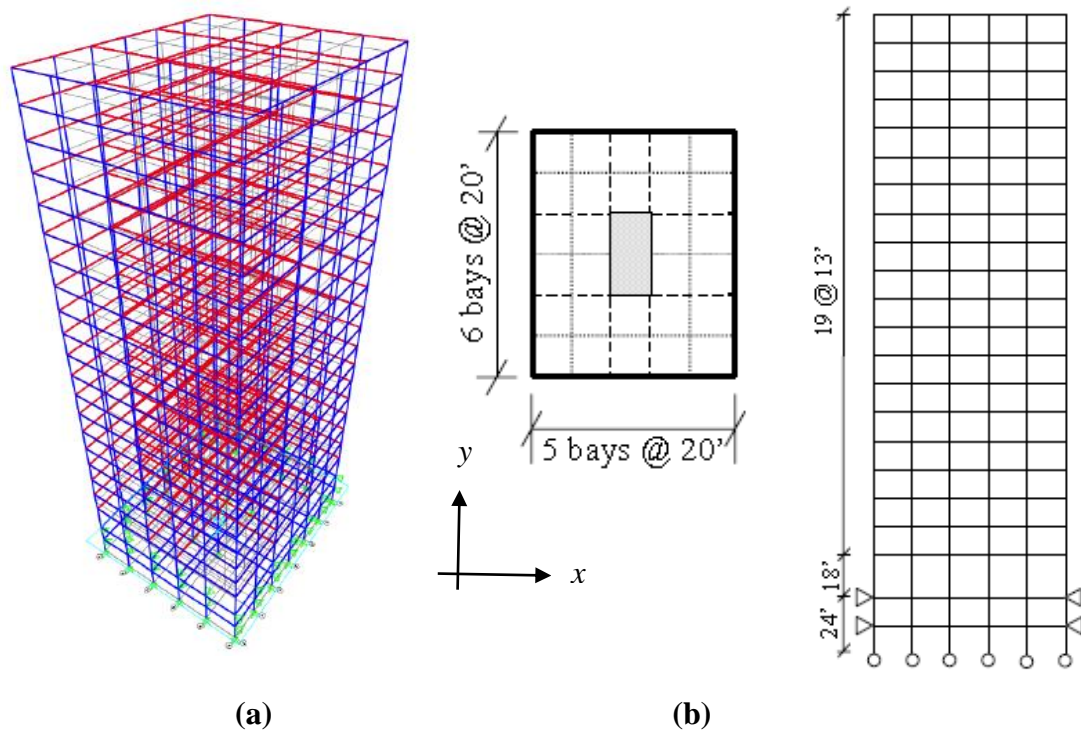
20-story building a) Finite element model b) Geometric dimensions [13]
